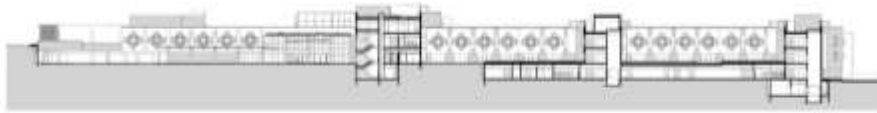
Section showing shallow floor plates (source: ArchDaily, 2017a)
